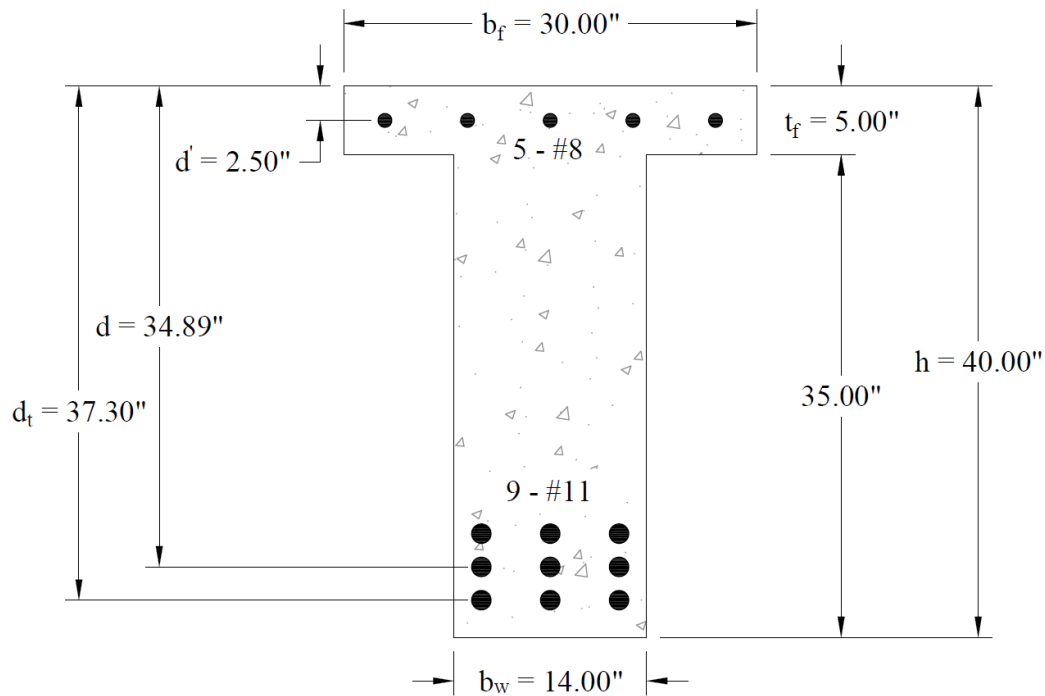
Flanged Reinforced Concrete Beam Cross-Section
